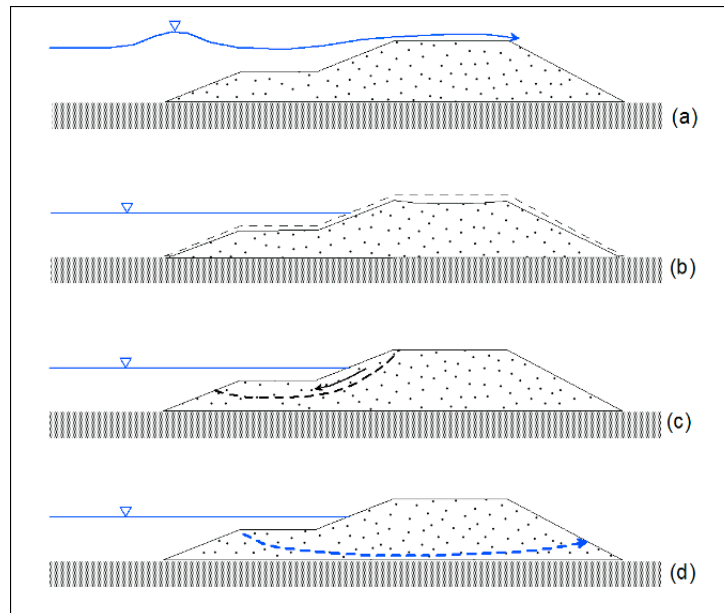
Principal failure mechanisms of a river levee: (a) overtopping, (b) excessive deformation, (c) scarp instability, and (d) piping
